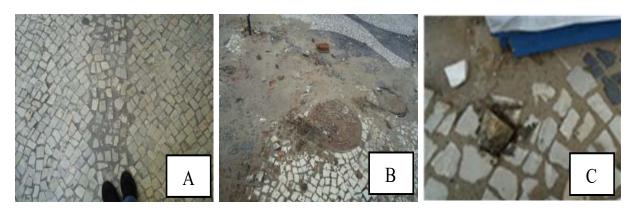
A - Bad intervention, B - detachment and C - staining.
